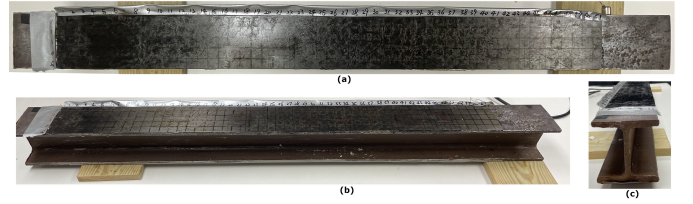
Steel beam specimen (a) top view (b) front view (c) side view.
